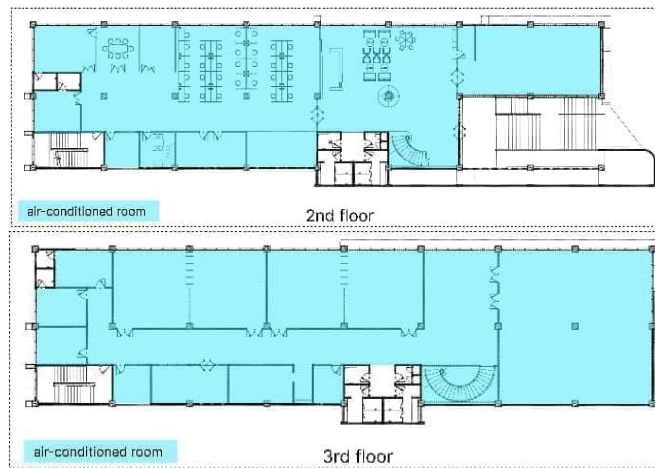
floor plan of the air-conditioned room (source: author, 2026)
